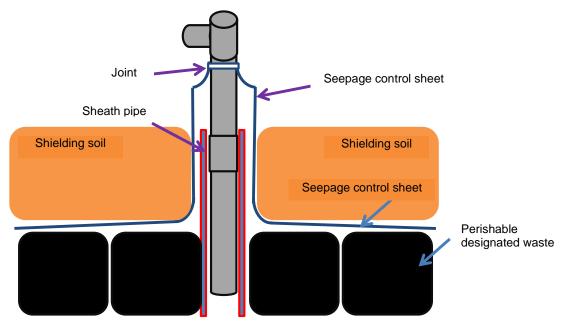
Rainwater measure at the joint of the gas venting pipe (construction example)
